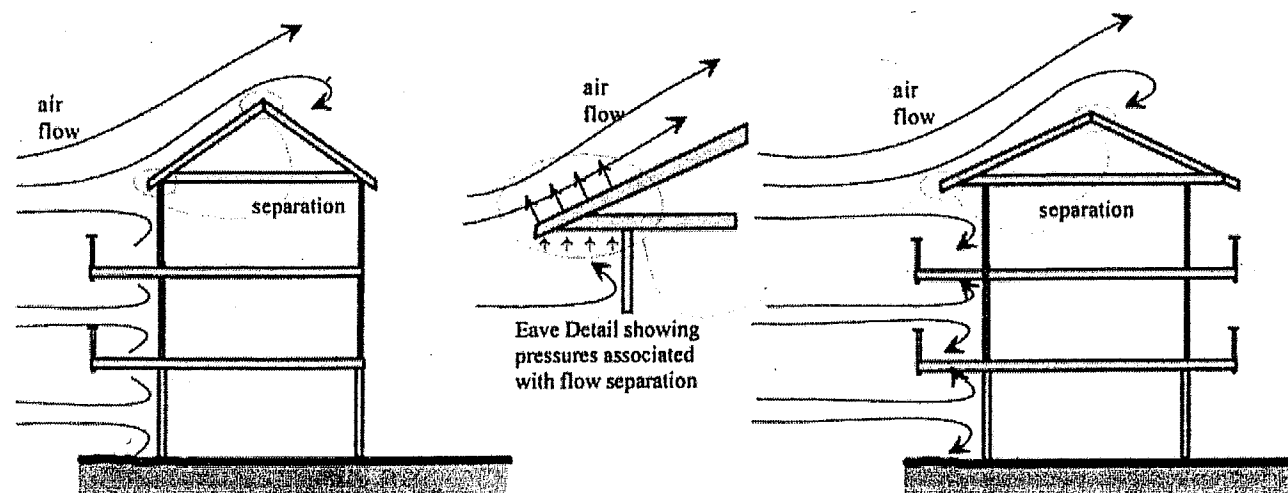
Schematic showing airflow on buildings with balconies and overhangs
